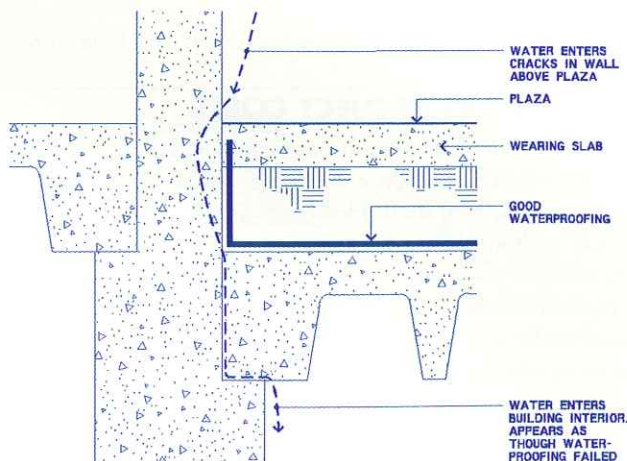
Wall cracks above plaza surface allow moisture to bypass waterproofing.
